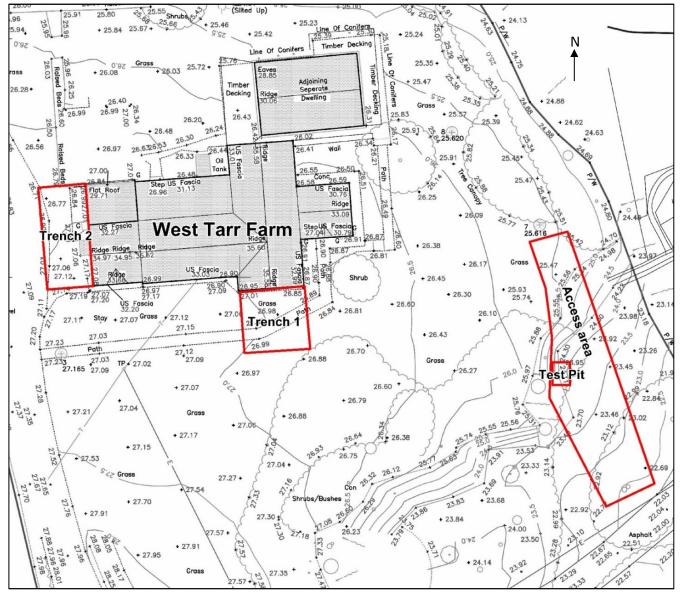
Plan showing location of the foundation trenches, and extent of watched area for new highway access and excavated test pit. (Plan not to scale; supplied by Tim Colquboun Architects Ltd)
